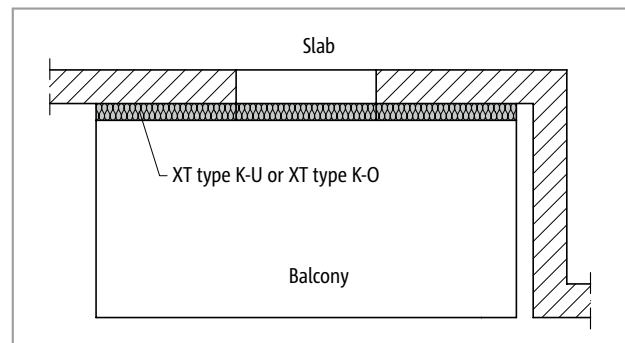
Schöck Isokorb® XT type K-U/K-O: Balcony with facade offset
